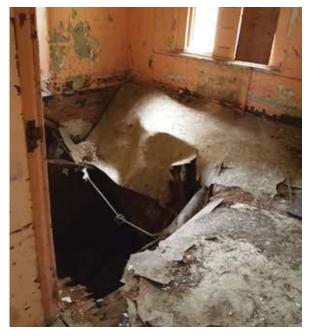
Floor collapse in Room 7, first floor (CJSA 2019)
